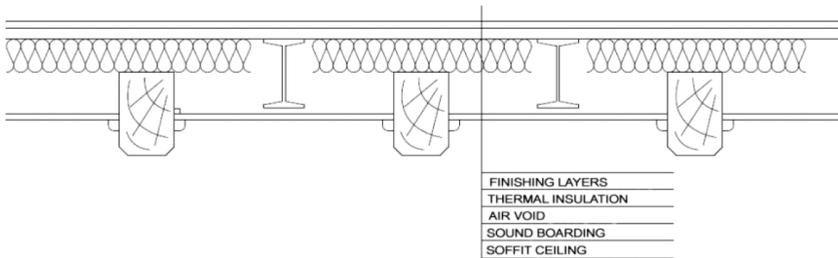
Exemplary solution of independent reinforcement of a wooden ceiling
